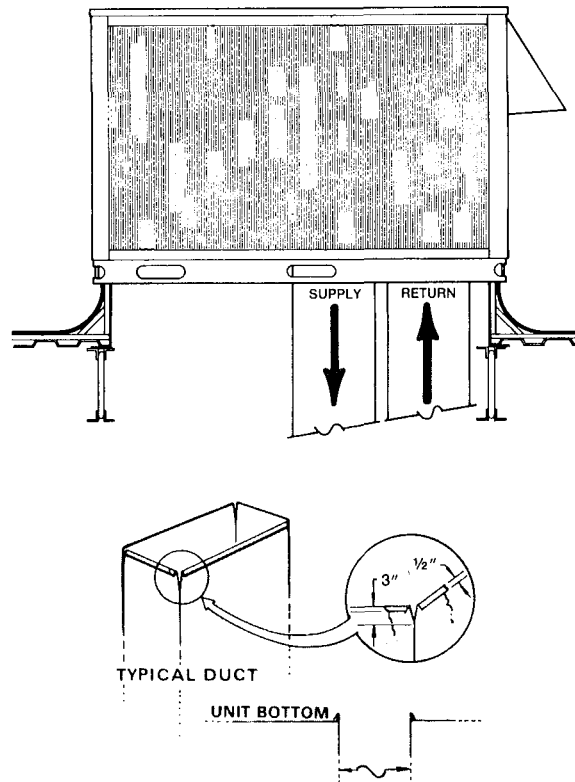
ACRB 0820 Roof Curb (Condenser Section Overhang)
